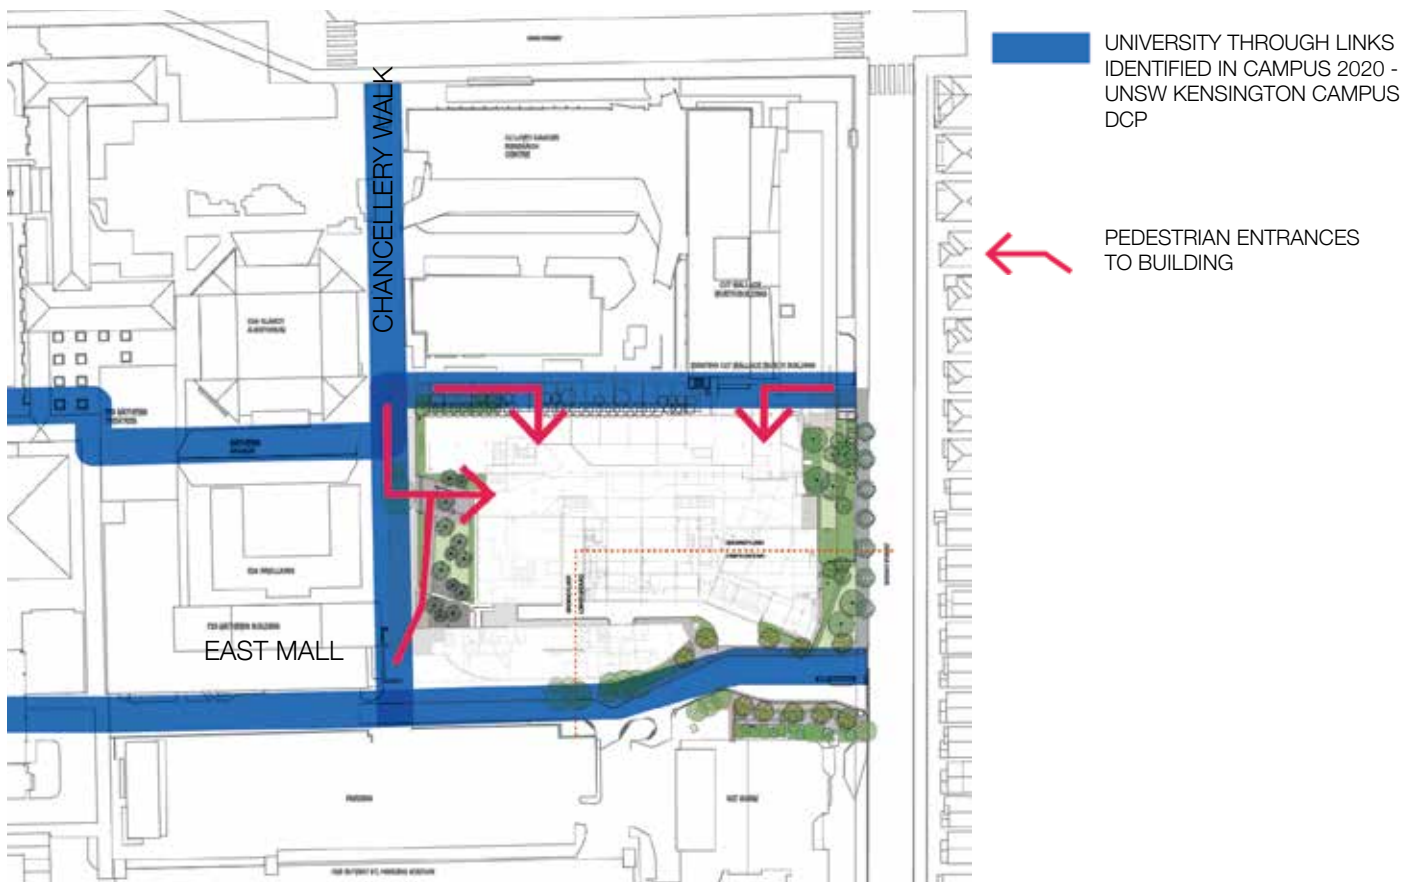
SITE THROUGH LINKS AND PROPOSED BUILDING ENTRANCES
